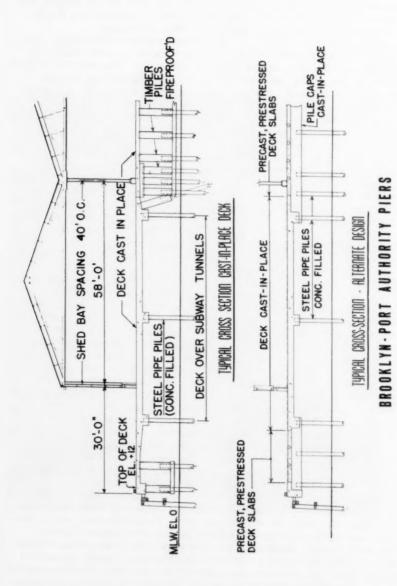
Brooklyn - P. A. Piers - Pier 2 - Alternate Deck Designs
